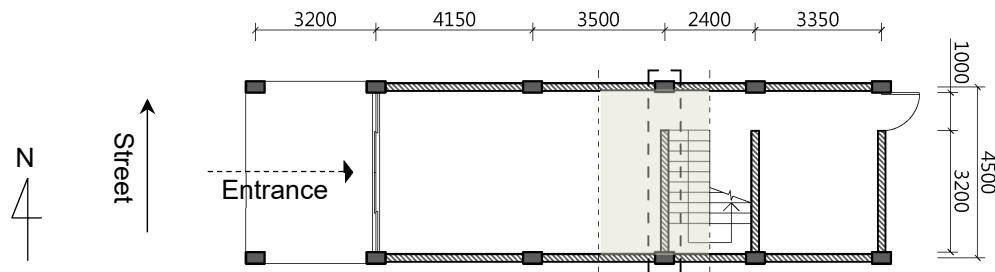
Typical Ground Floor Plan of a Street-building (Unit:mm)
